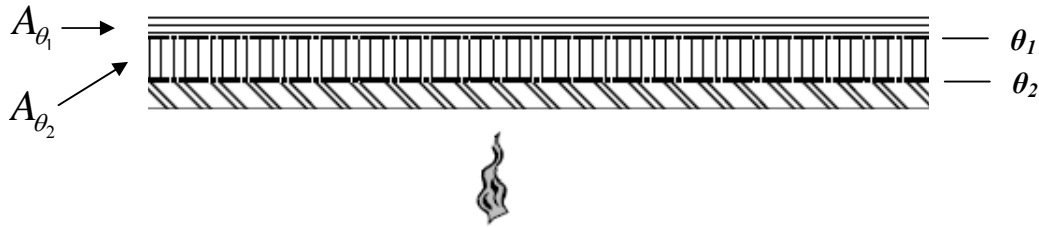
Cross-Section of Masonry Wall after Exposure to Fire on One Side
